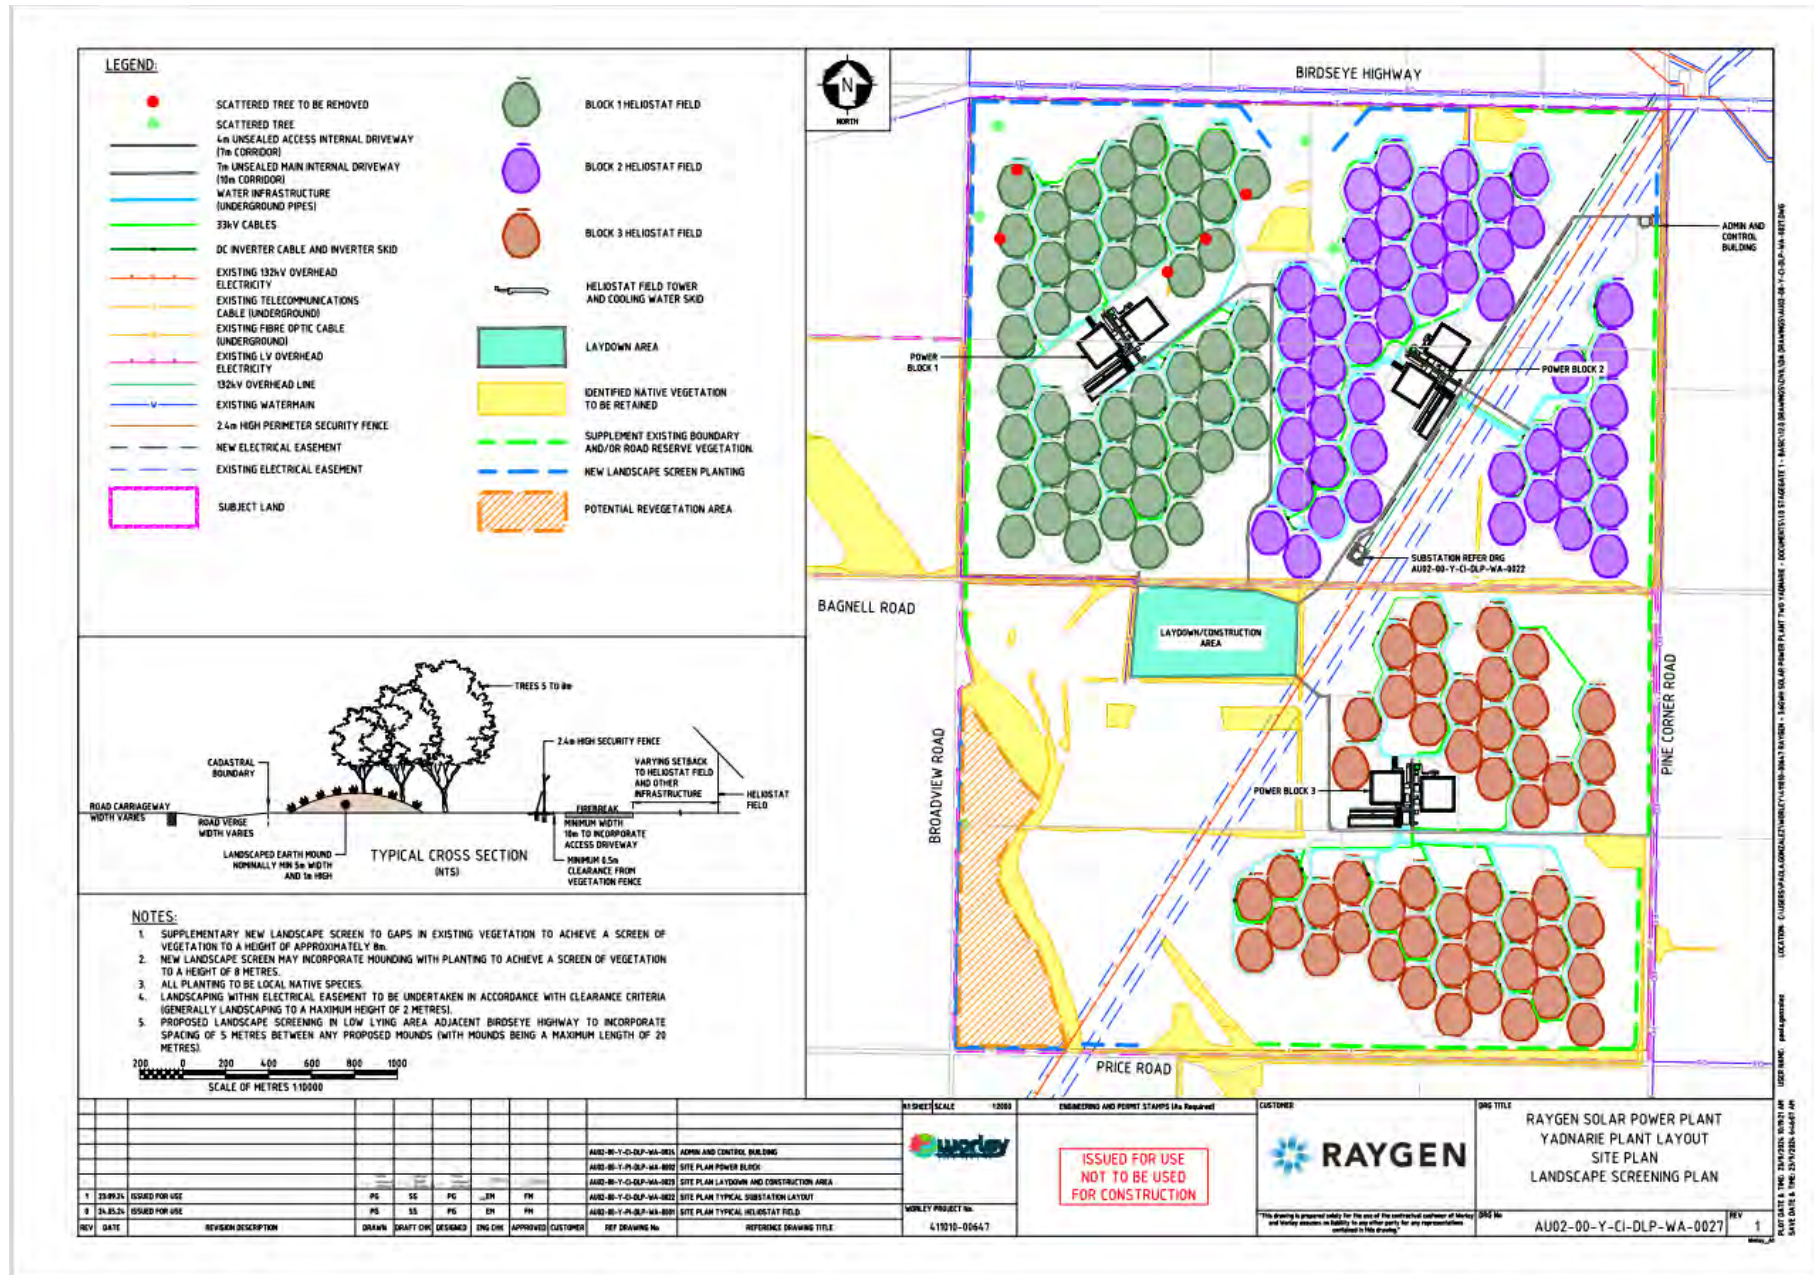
The current design of the Yadnarie Solar Farm, provided to EBS by MasterPlan on 24 September 2024.
